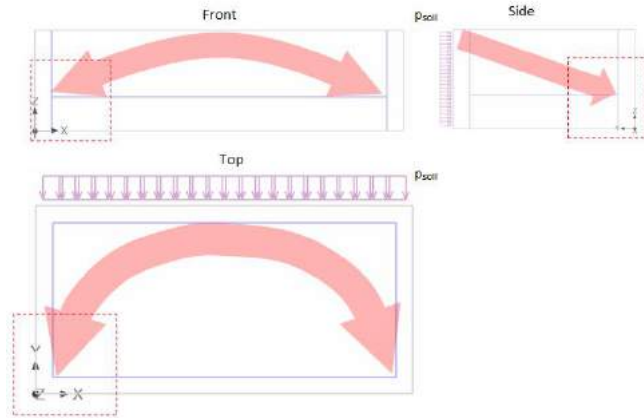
Stress distribution to bar reinforcement, 2D (arc not to scale)
